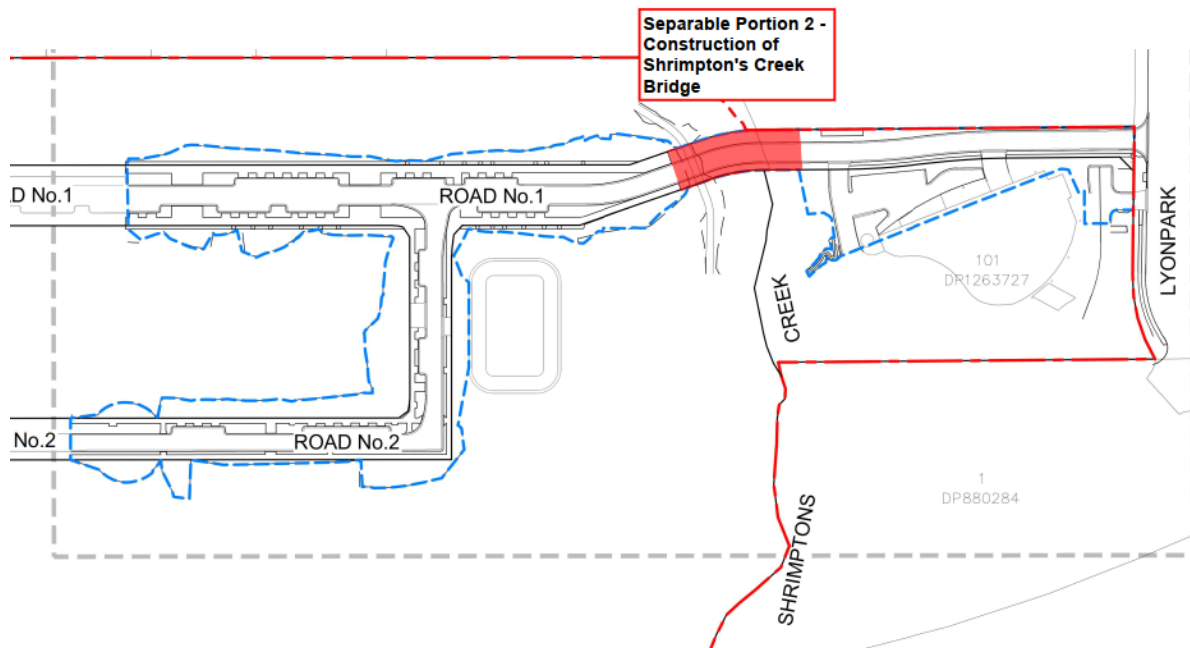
Separable Portion 2 – Construction of Shrimpton's Creek Bridge
